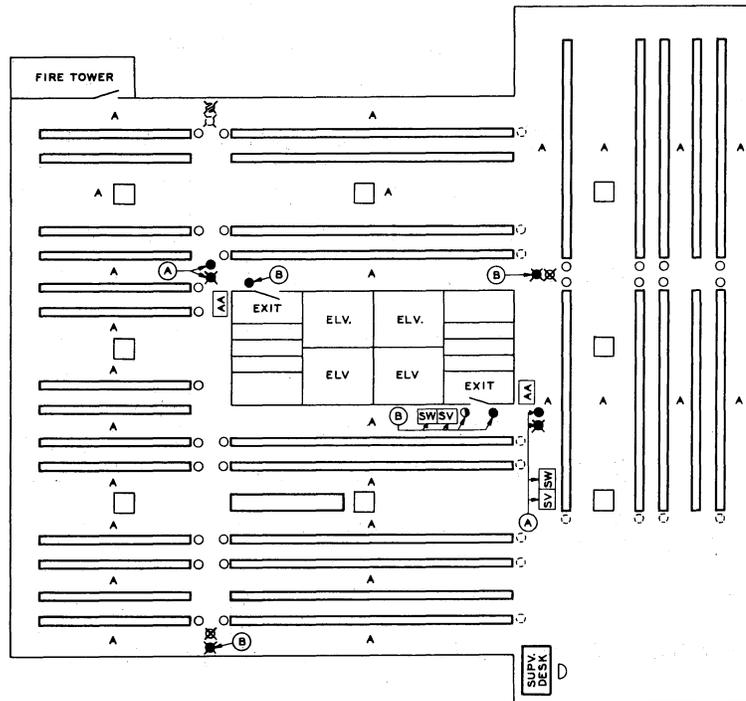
Typical Audible and Visual Alarm Equipment in Office With Central Elevator Shaft and Aisles in Two Directions—Terminal or Switchroom
